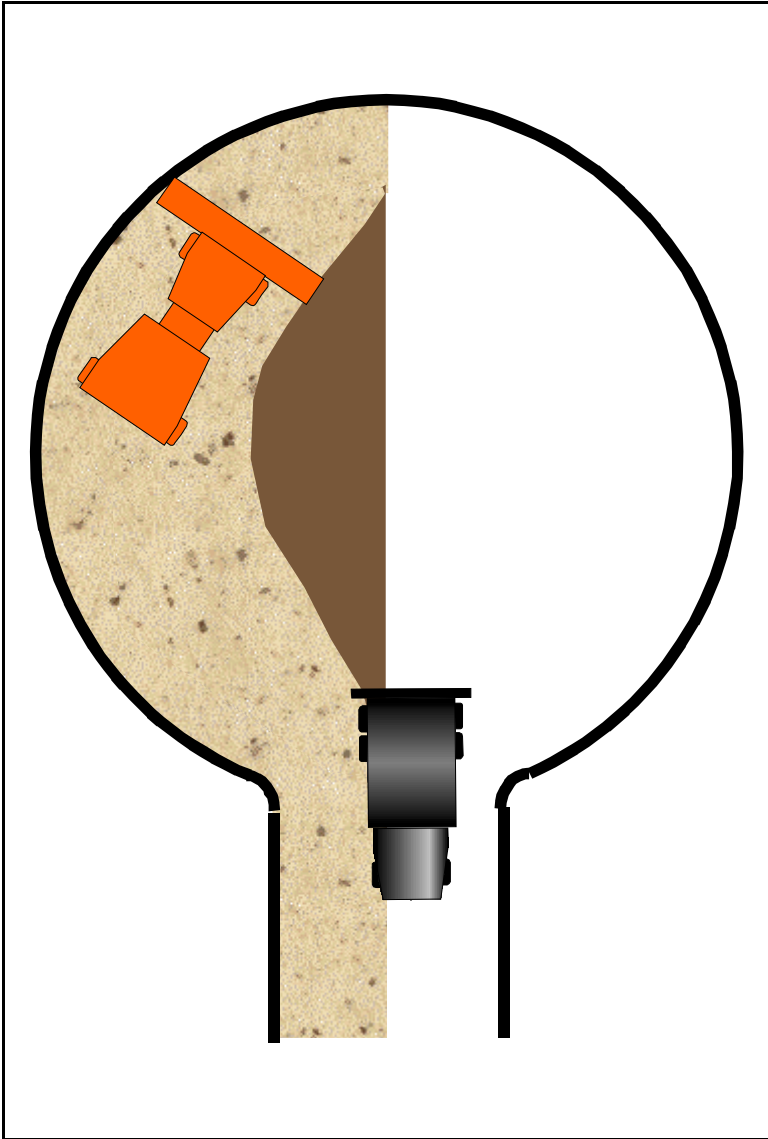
After backing into place, the distributor completes half of the cul-de-sac. The chip spreader and rollers begin working.
